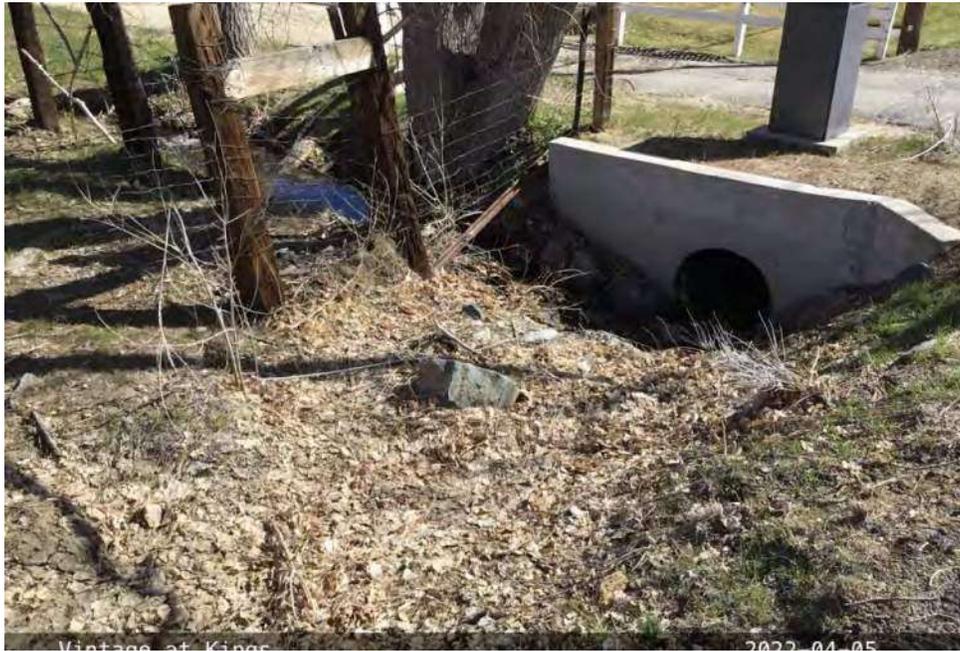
AR-3 at southeast corner of Survey Area where waters, when present, exit off-site into storm drain. View looking northeast.
